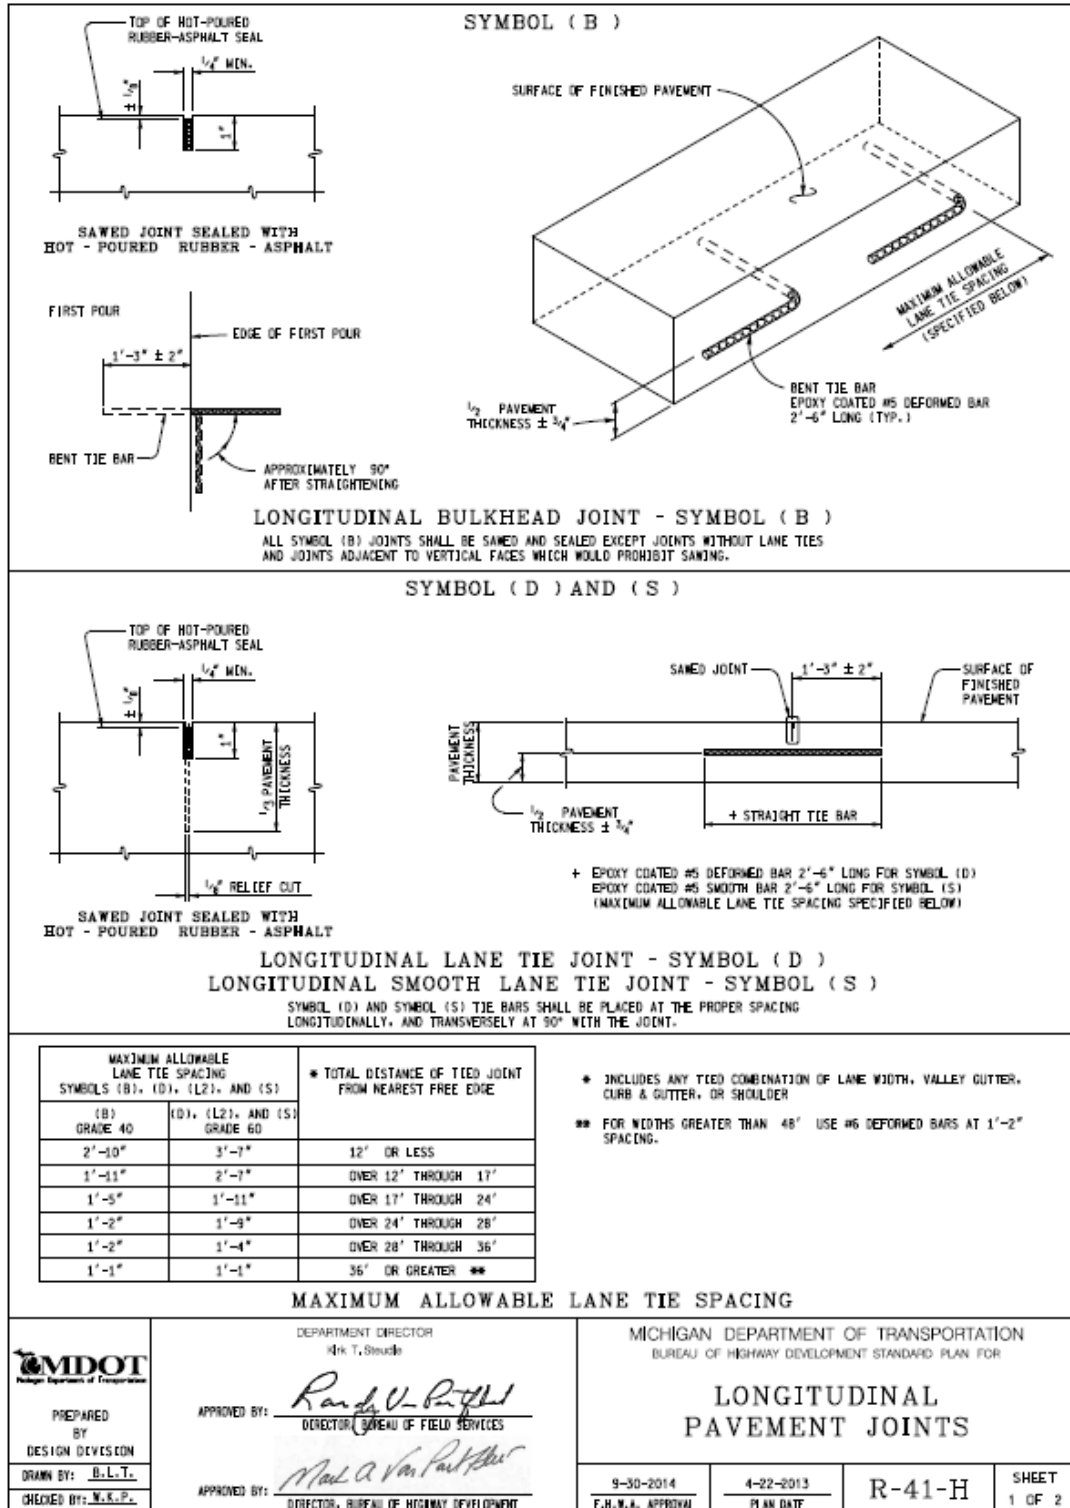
Longitudinal pavement joints (Michigan DOT 2020a).
